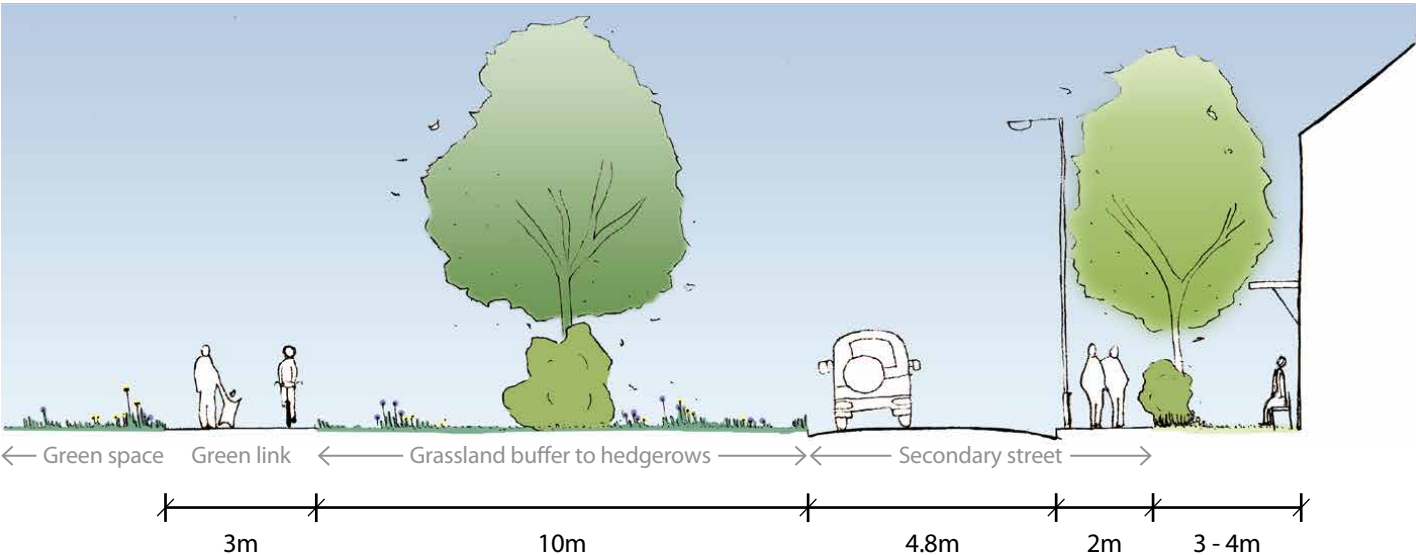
B-B – typical secondary street cross section (refer to Fig. 16 for section location)
